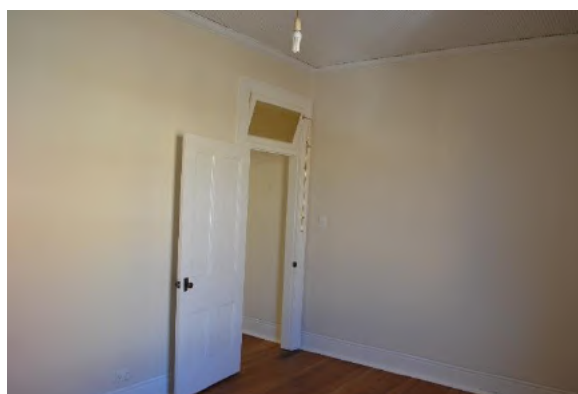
Dining Room (Space 2.4)—50A / 48–56 Gloucester Street, showing four panel door and original architrave. Original cement run skirting with timber quad mould and original timber floor. (Source: GML Heritage, July 2016)
